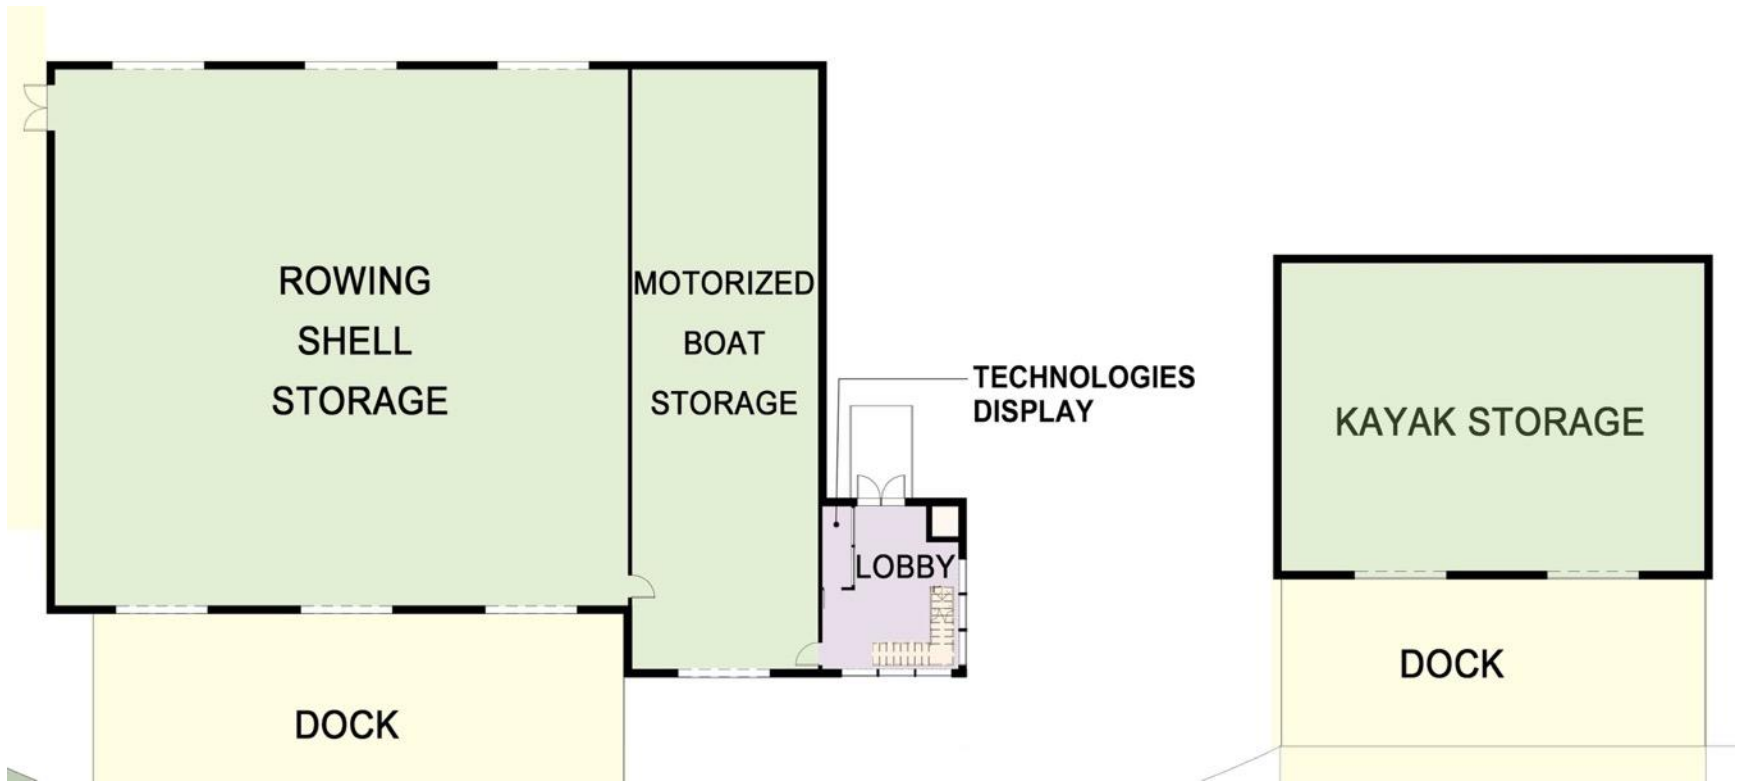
Enlarged Ground Floor Plan (not to scale), source: author
